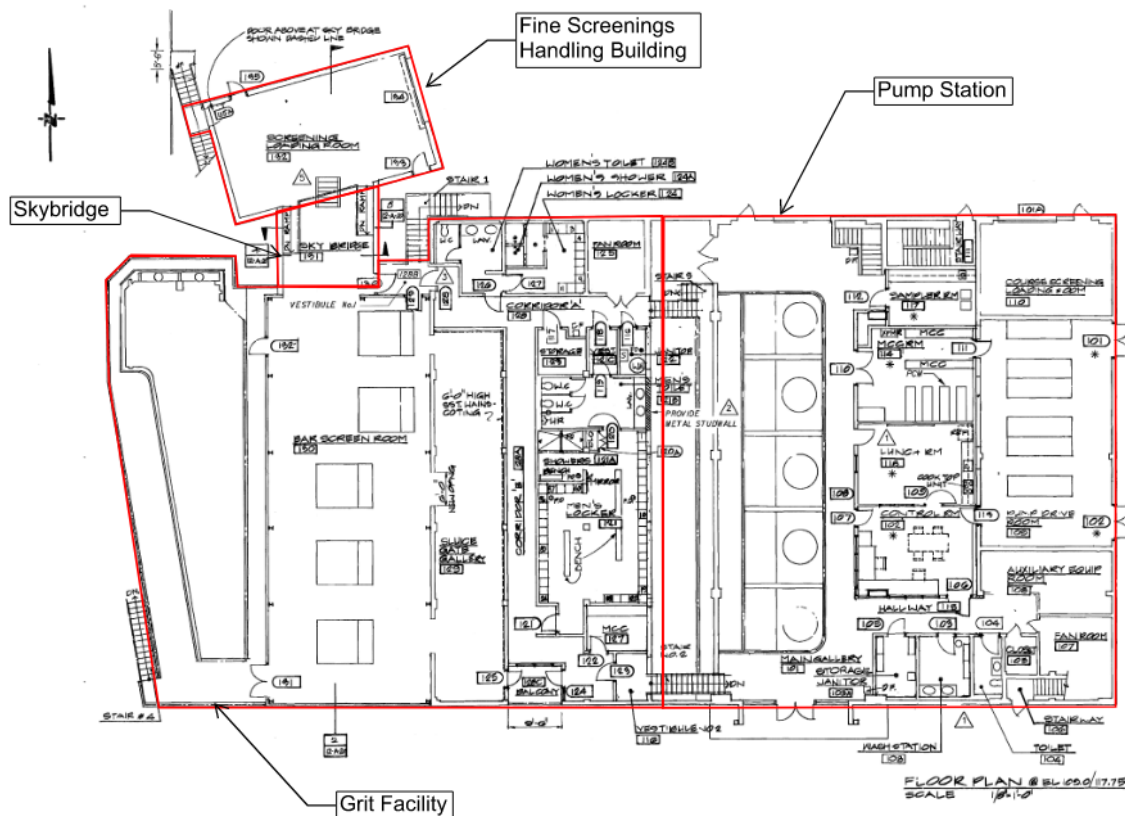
IPS Facility Elements Shown at Ground Floor Level and Above
